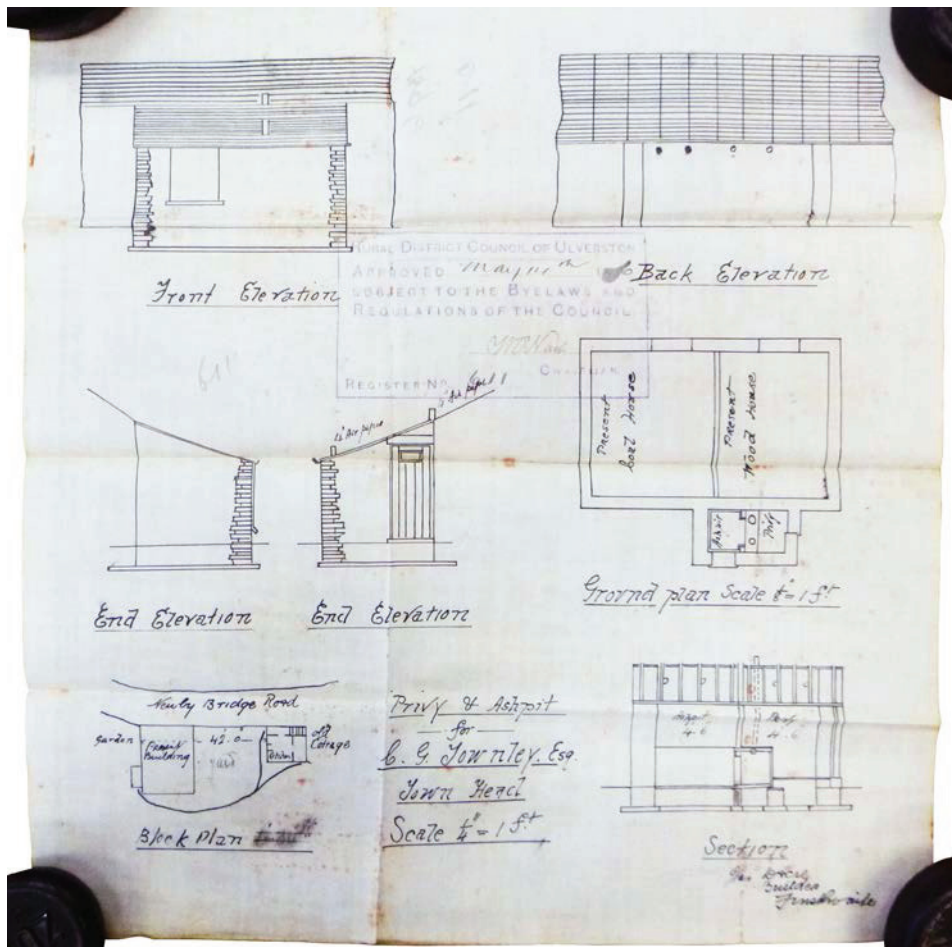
Detailed drawing of proposed new privy and ash pit, 1896
